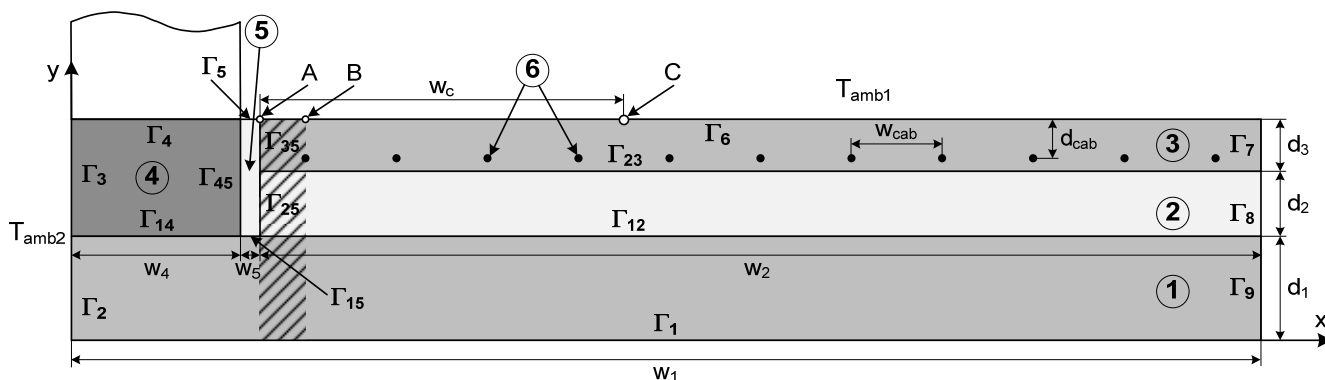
Half of the cross-section of electrically heated floor: 1 - concrete base, 2 - basic thermal insulation, 3 - concrete slab, 4 - outer wall, 5 - side thermal insulation, 6 - heating cables were compared with solutions of a model with perfect (adiabatic) insulation of vertical walls of the concrete slab.
